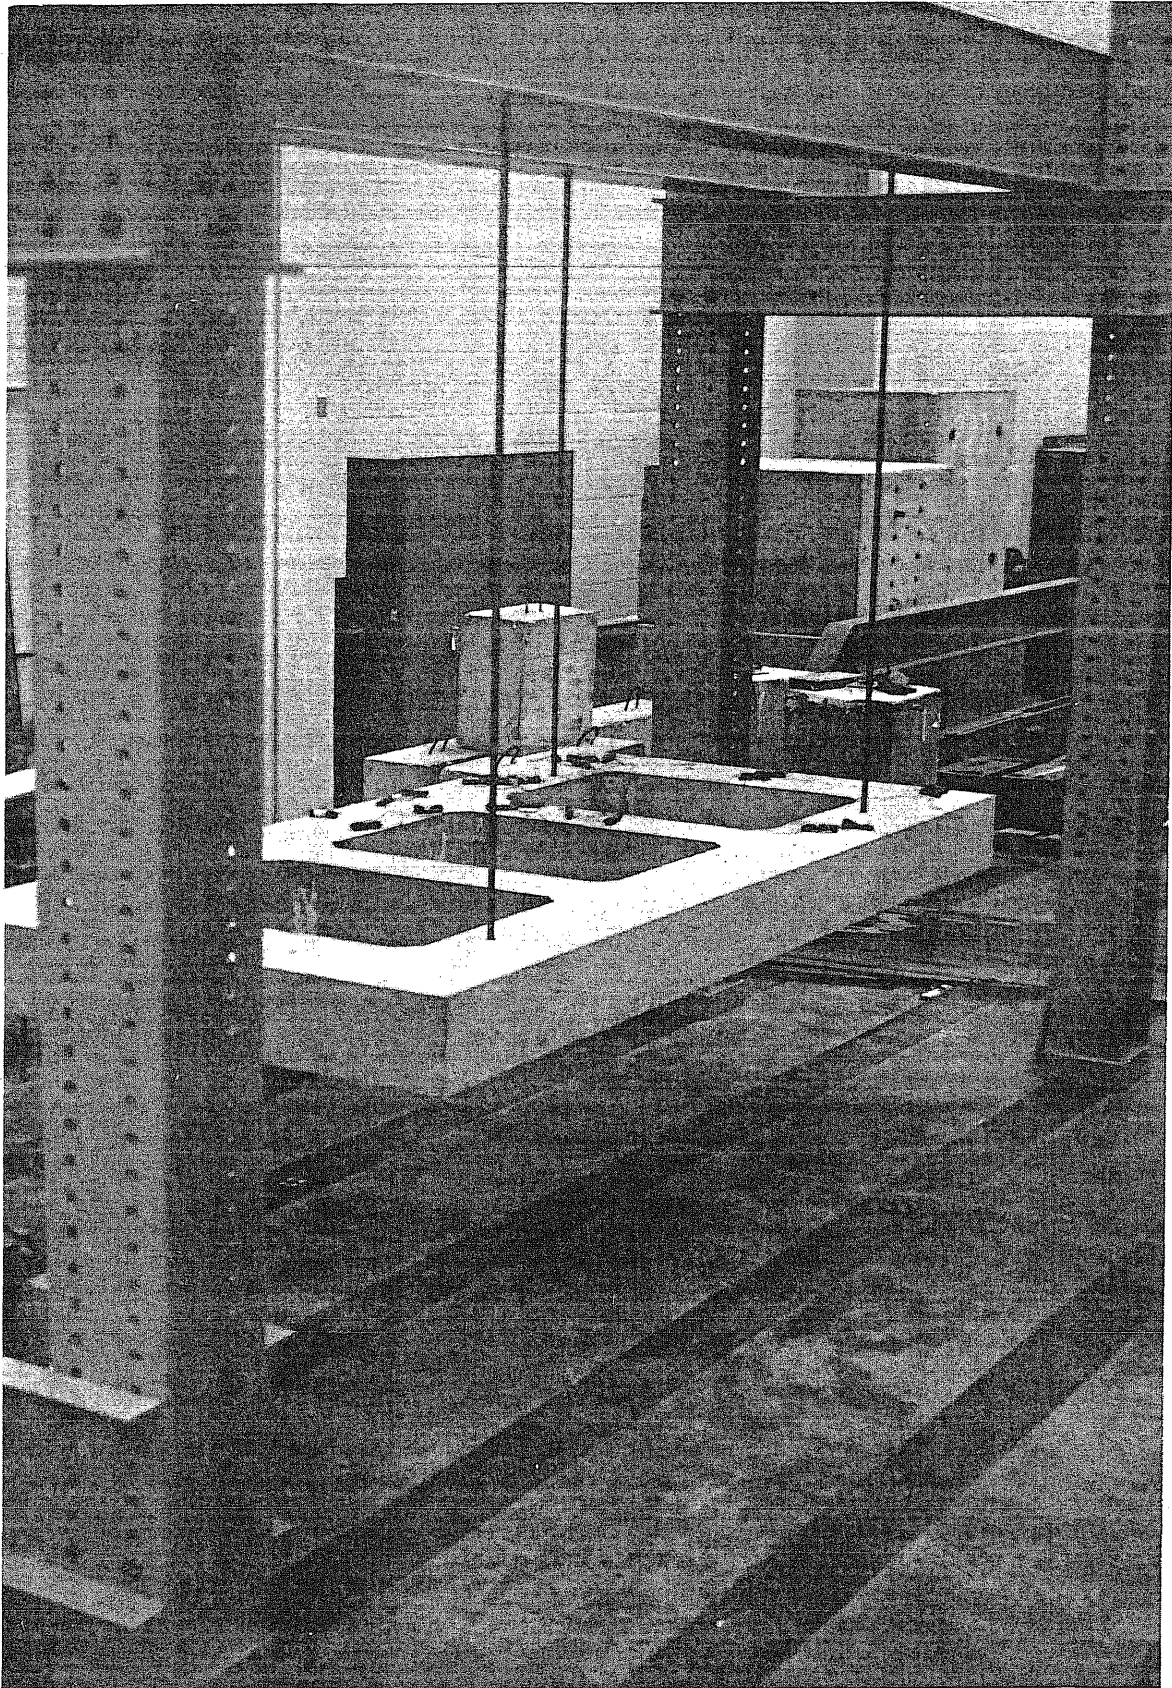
PHOTOGRAPH OF SPECIMEN R1 IN TEST FRAME BEFORE ASSEMBLY OF LEADING EQUIPMENT
